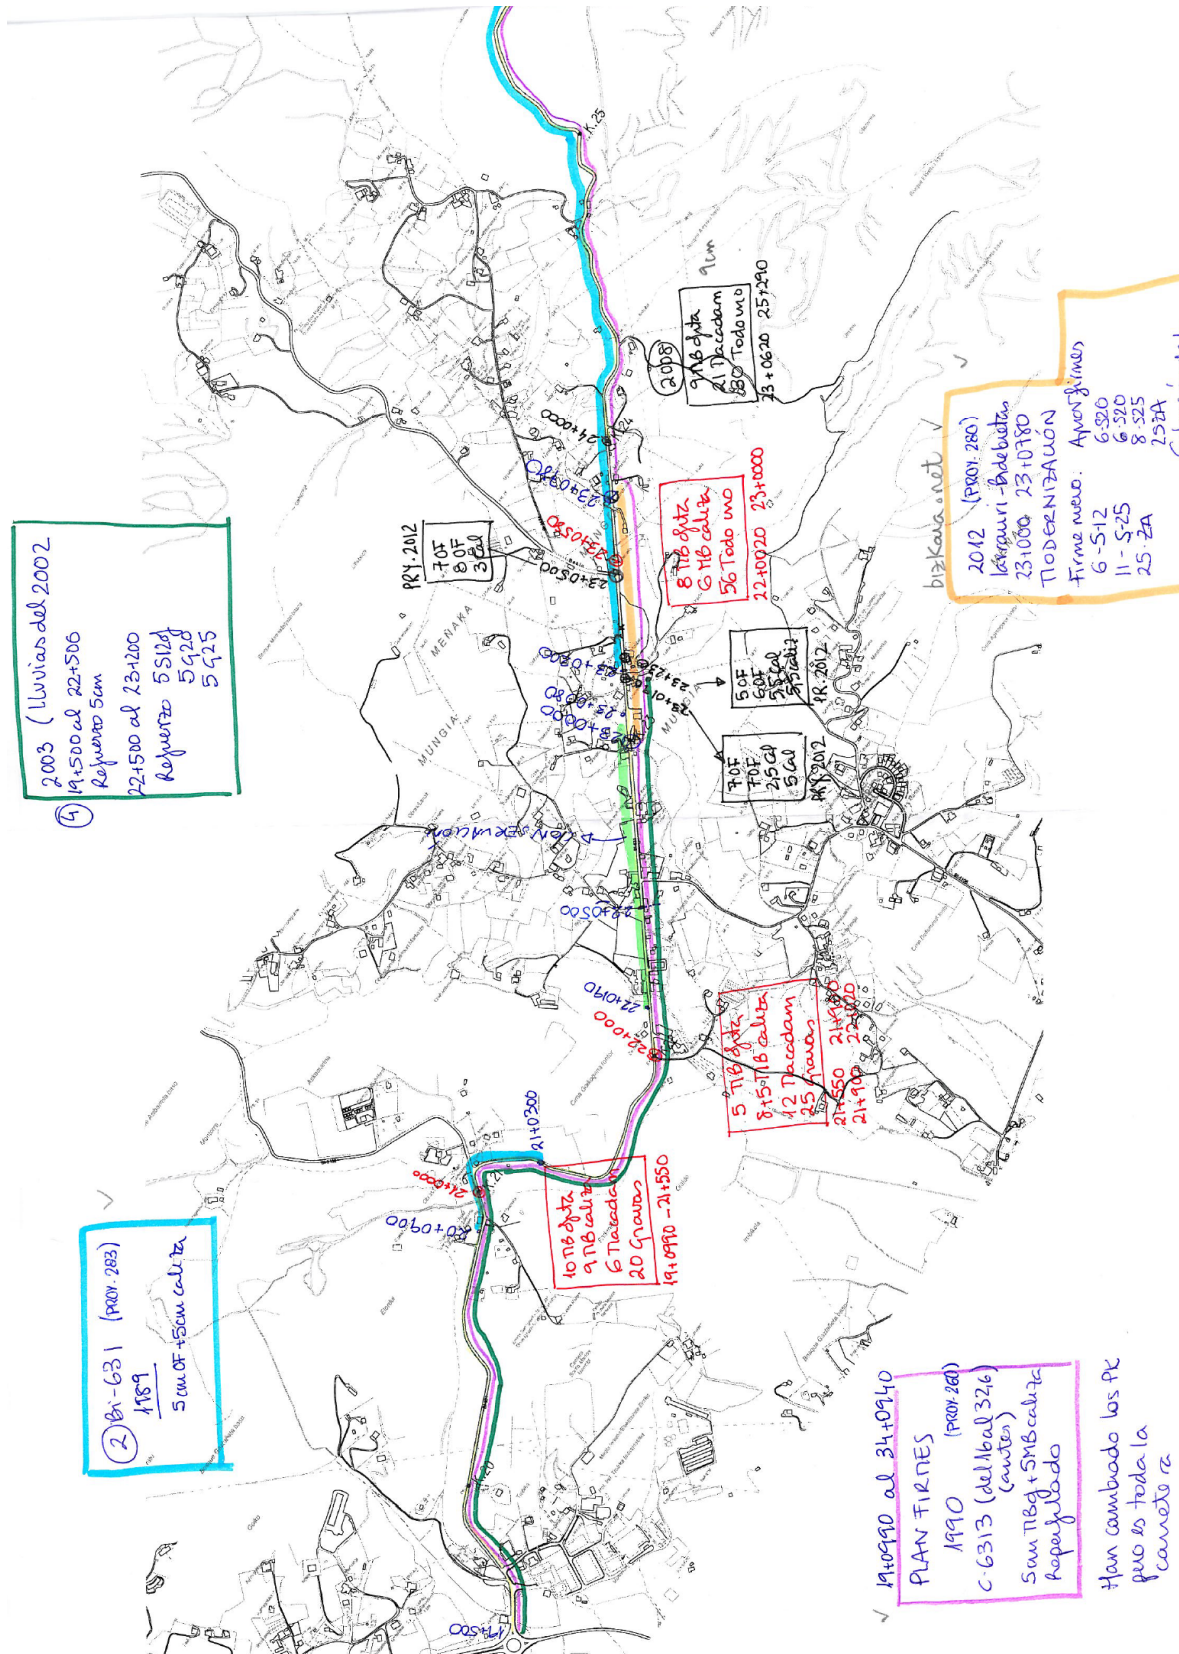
Preliminary scheme of the road BI-631 (stretch Mungia – Bermeo) used by engineers of the UTE Agenda de Estado to observe all the projects conducted in the road.
